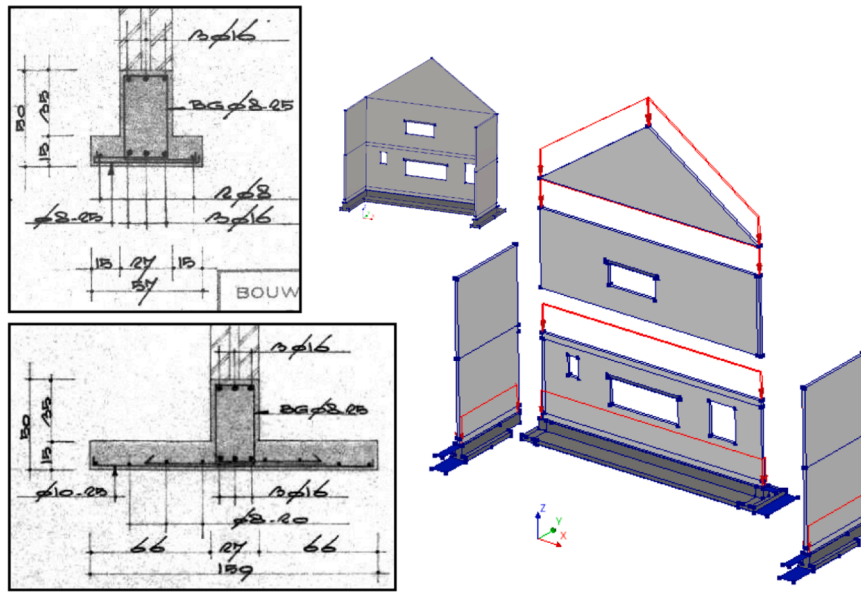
Exploded CaSi façade with strip-plate reinforced concrete foundations.
